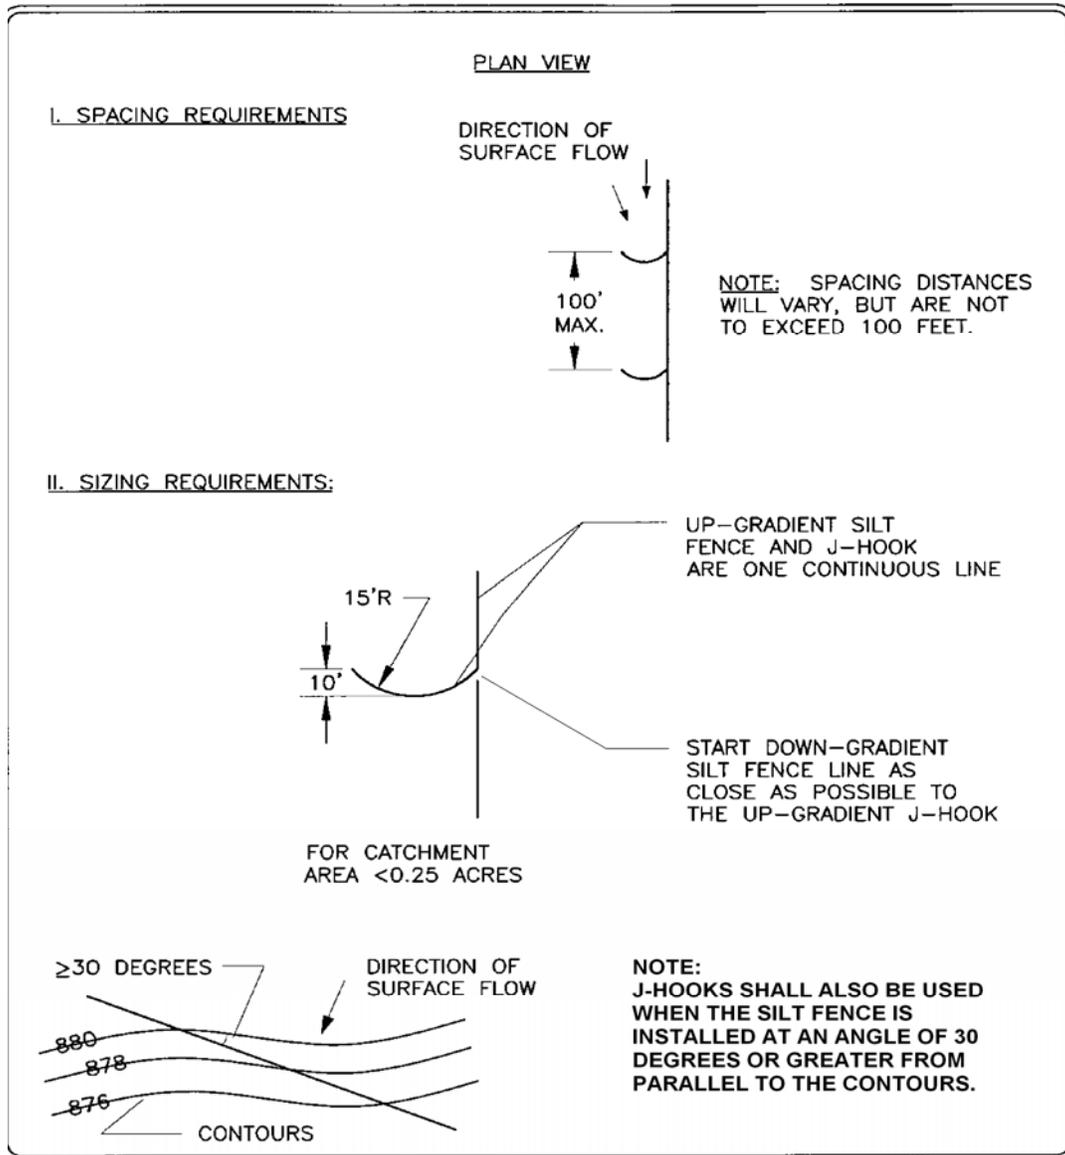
H Silt Fence J - Hook Detail (N.T.S.)
